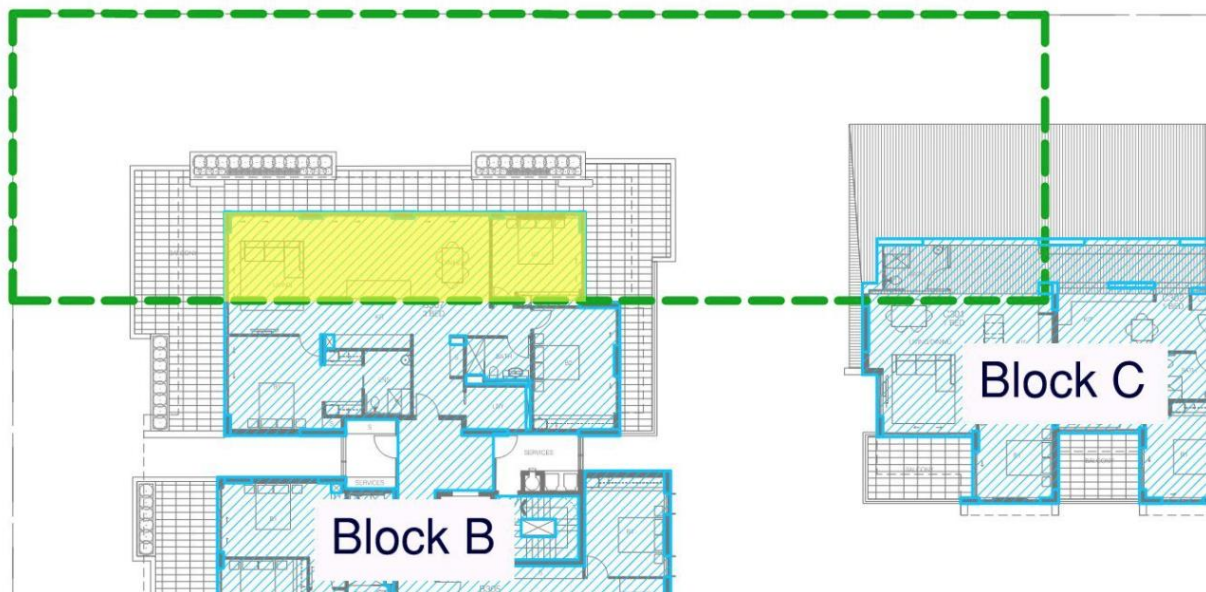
Extract of GFA Plan showing extent of contravention in yellow (Source: Hyecorp/Amglen)
